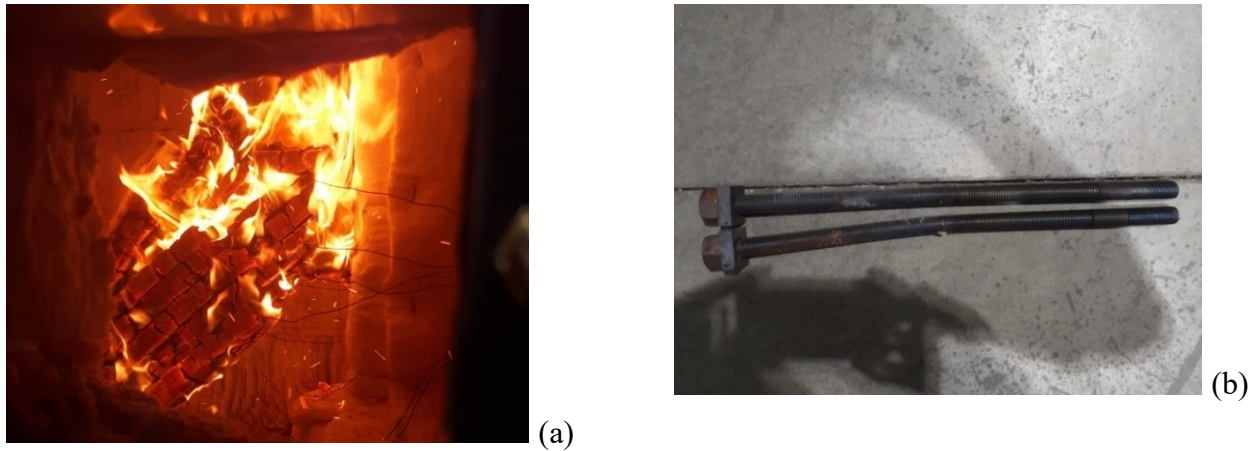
Test-BCF 200-1.5-A after failure: (a) Connection just after failure; (b) Steel rods after failure.
